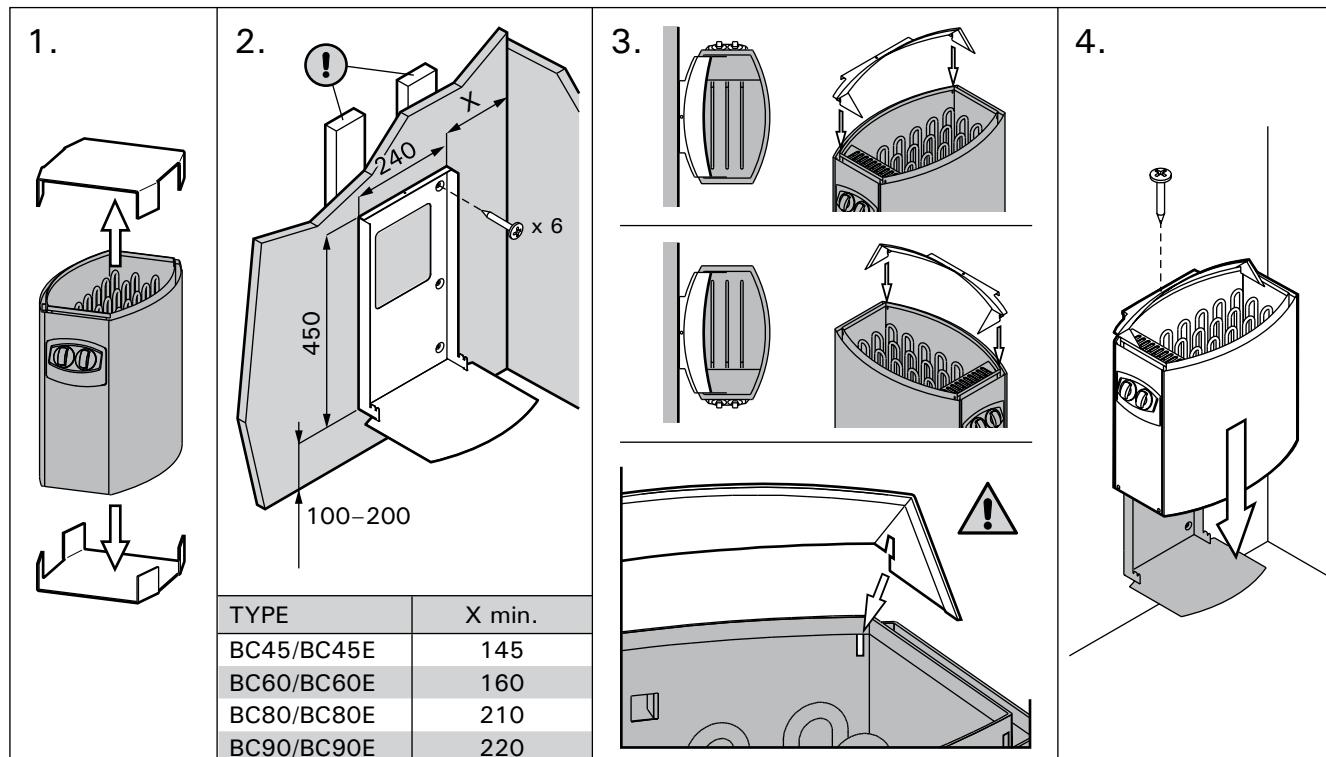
Fastening the heater on a wall (all dimensions in millimeters)
